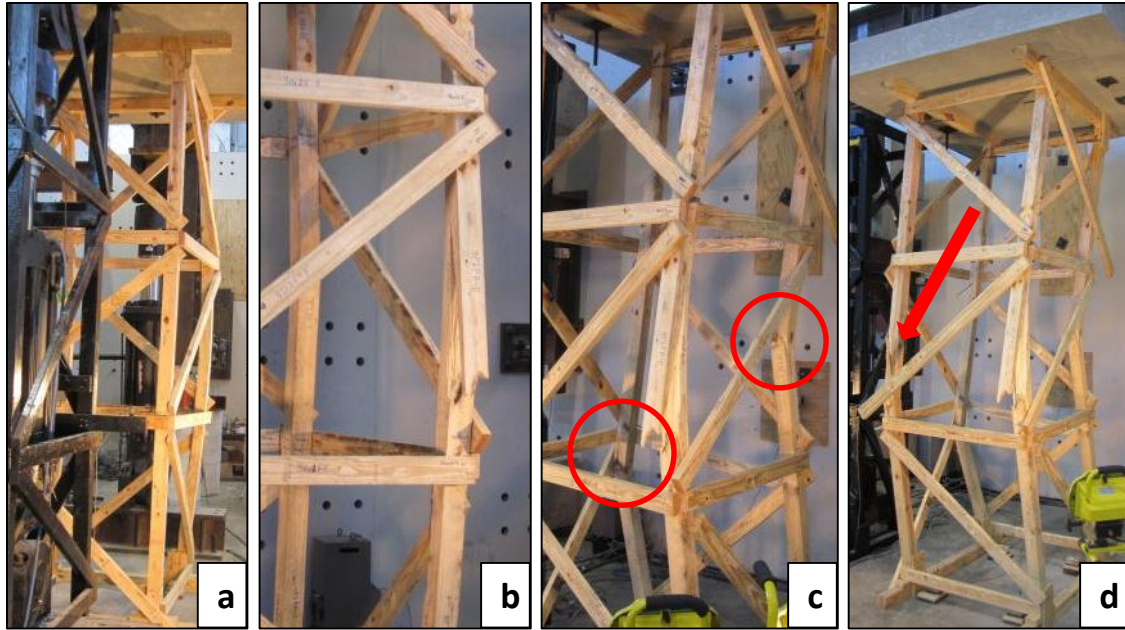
Specimen 3 (a) Bowing of front-right post (b) First failure (c) Second failure (d) Third failure
